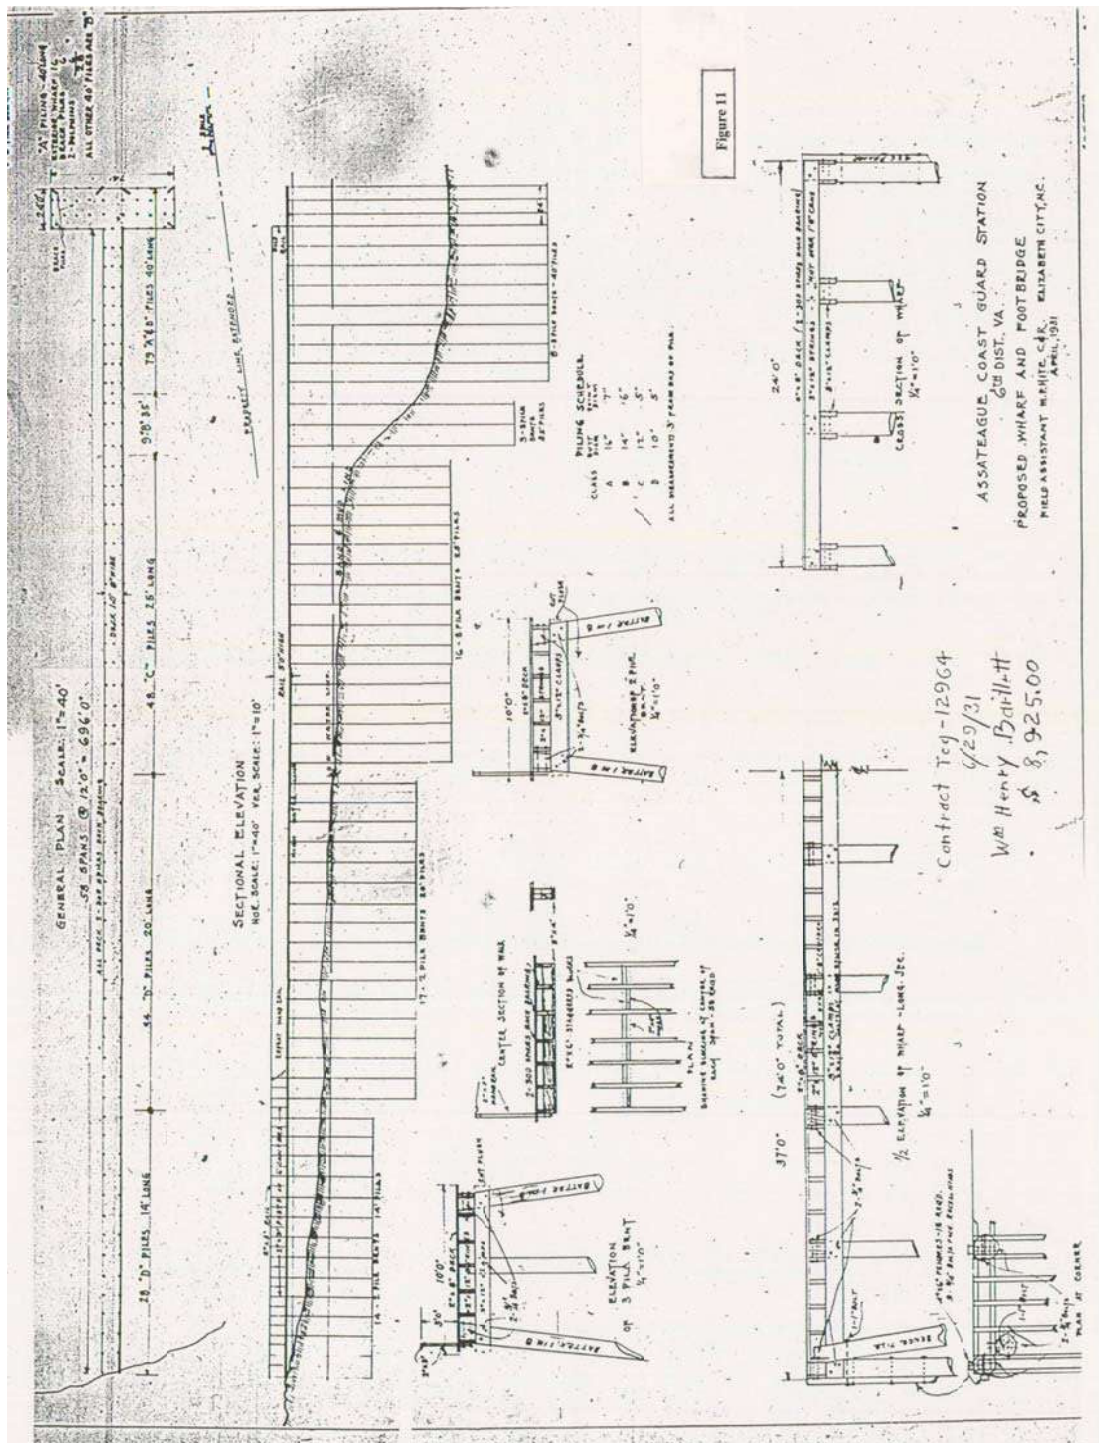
Assateague Coast Guard Station, Proposed Wharf and Footbridge (April 1931).
